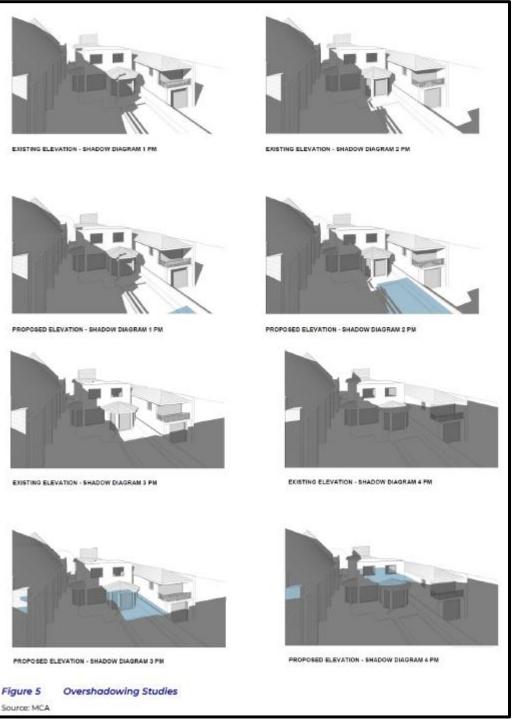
Figure 5 Referenced in Applicants Clause 4.6 Variation Request – Overshadowing Studies (Source: Architectural Plans).
